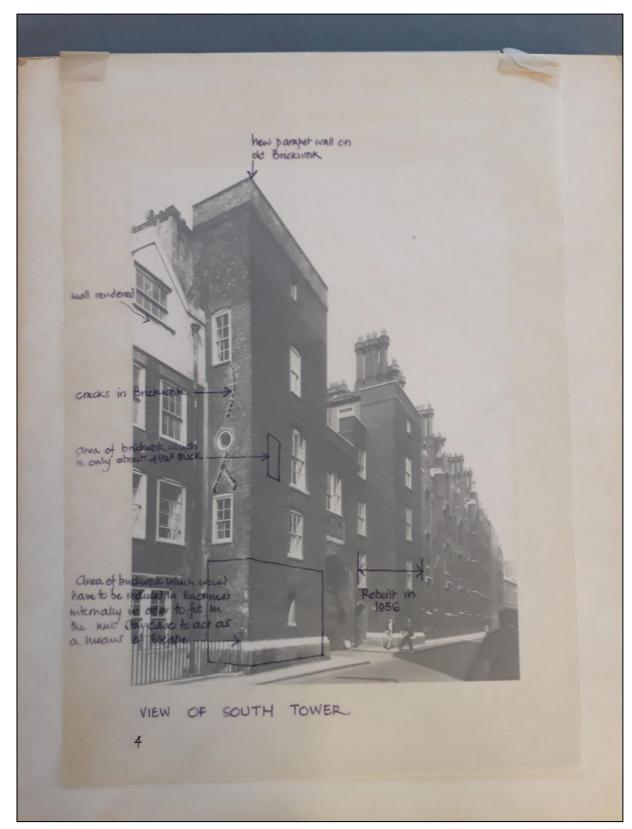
Annotated Photograph of the gatehouse showing the new parapet
